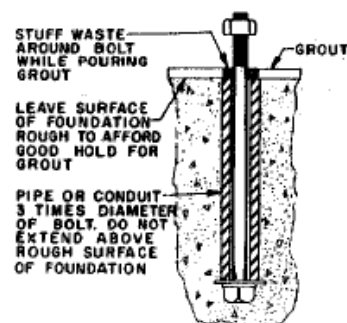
ARRANGEMENT OF FOUNDATION BOLT
